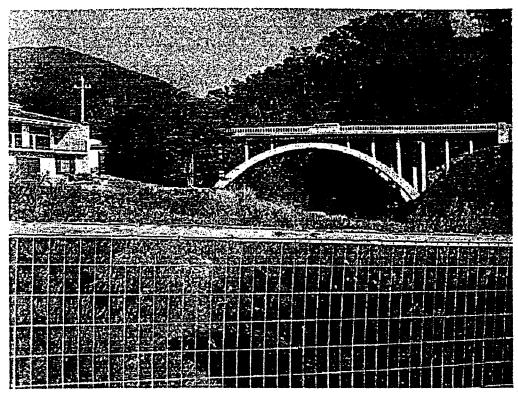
Photo of Highway One Bridge looking across Parcel APN 243-161-017 and 243-161-018.
